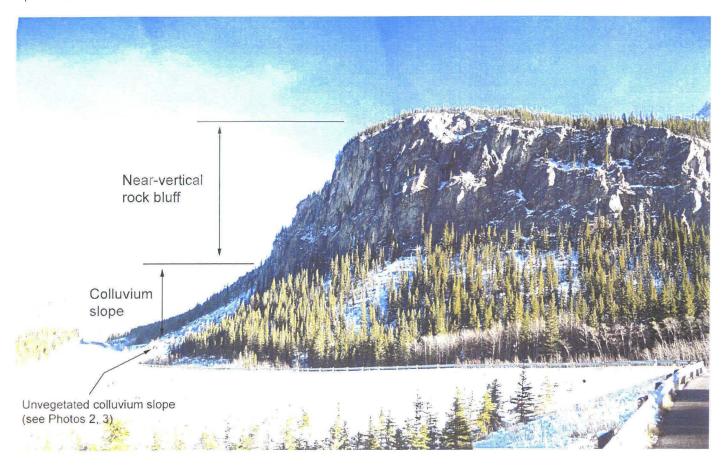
(top) – The Barrier Bluffs rock slope above Highway 40. The highway is located adjacent to the toe of a colluvium slope below a near-vertical rock slope. The colluvium slope is at an angle of around 35°. The ditch between the highway and the toe of the colluvium has a minimum width of approximately 10 m and a depth of approximately 3 to 4 m relative to the road surface.
